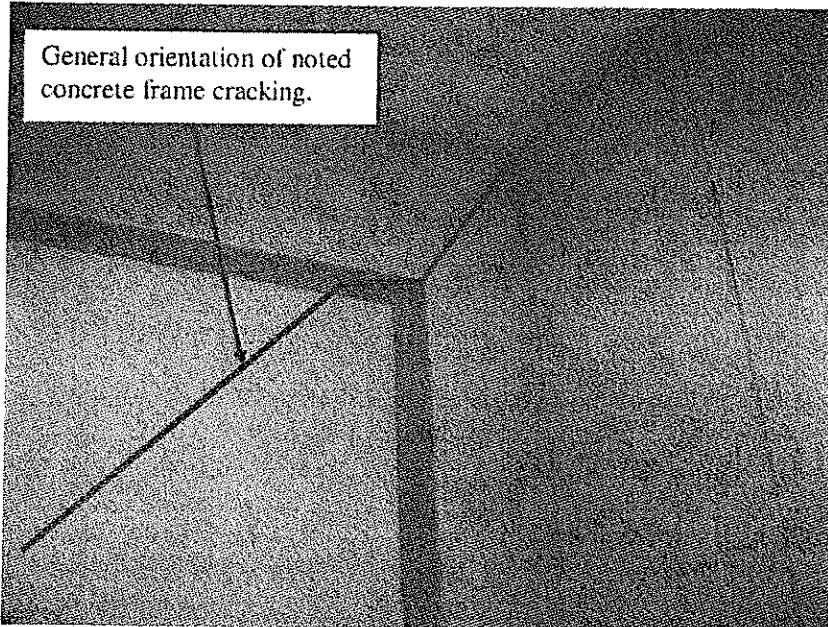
Sample Sketch of Concrete Frame Cracking at Fixed end of Cantilever
